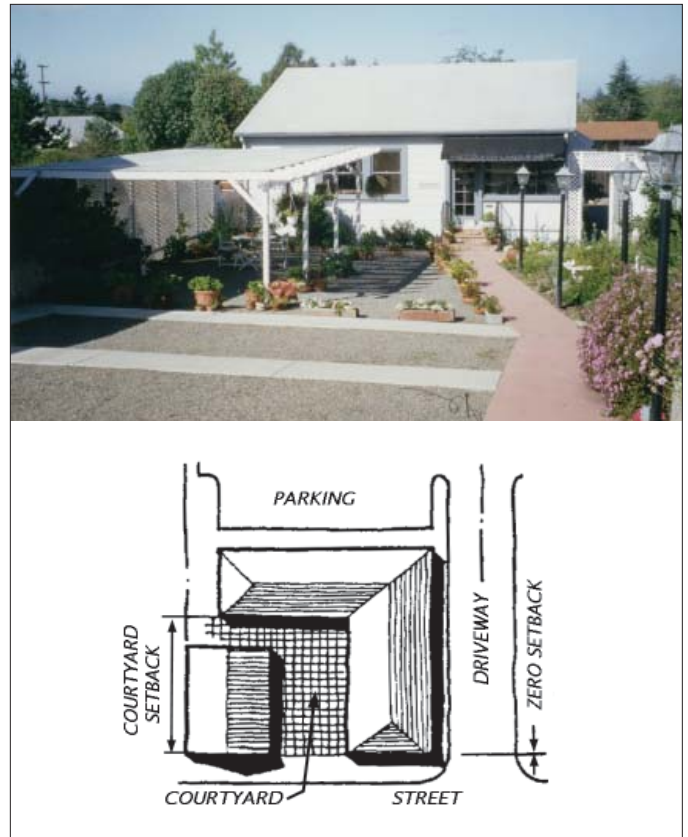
Buildings or portions of buildings are set back to create courtyards.
